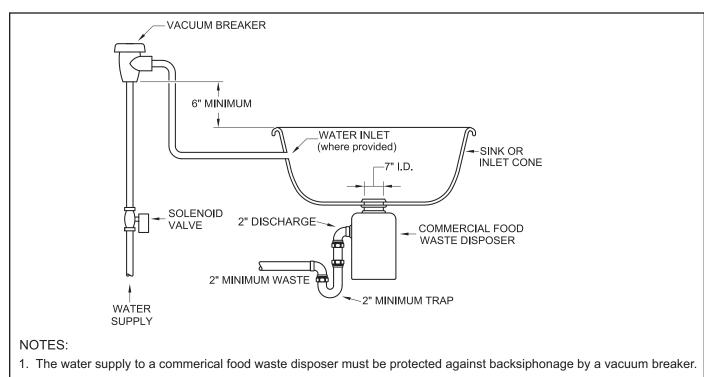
A COMMERICAL FOOD WASTE DISPOSER INSTALLATION
